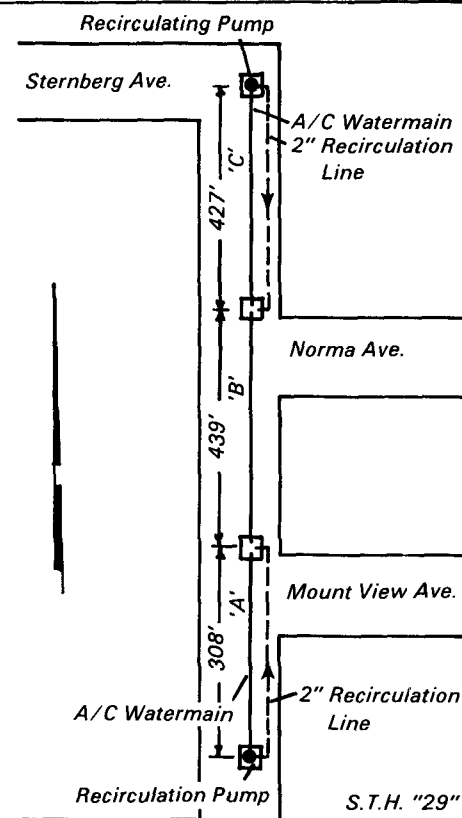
Schematic diagram of Fox Street watermain test sections A, B, and C.
